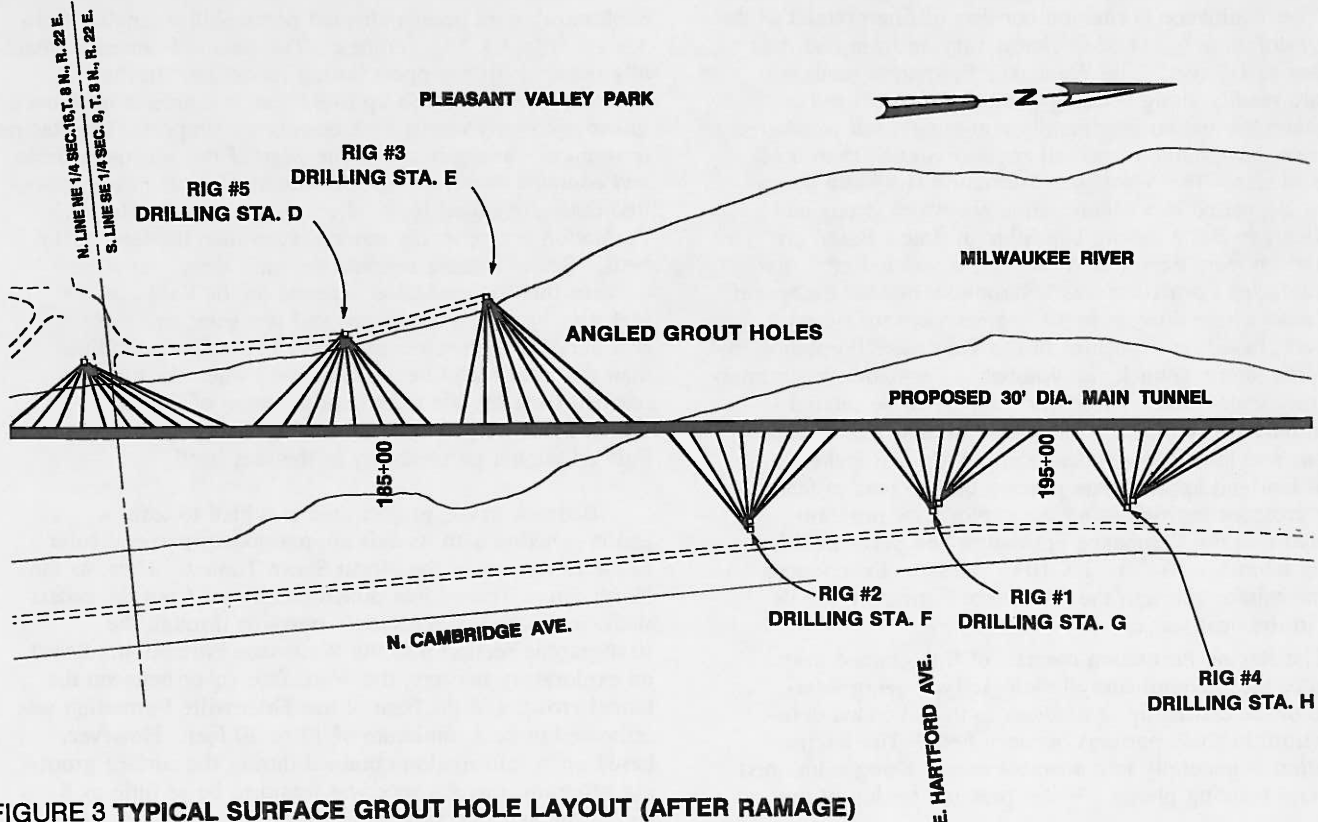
TYPICAL SURFACE GROUT HOLE LAYOUT (AFTER RAMAGE)
